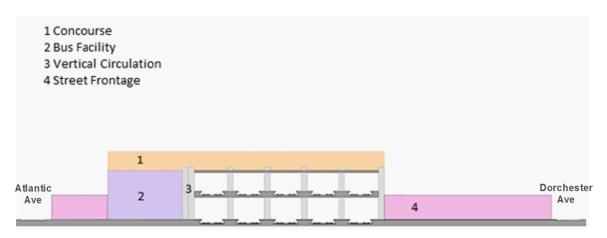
Unconstrained Rail Alternative 2 — Bi-Level South Station, Cross-Section
